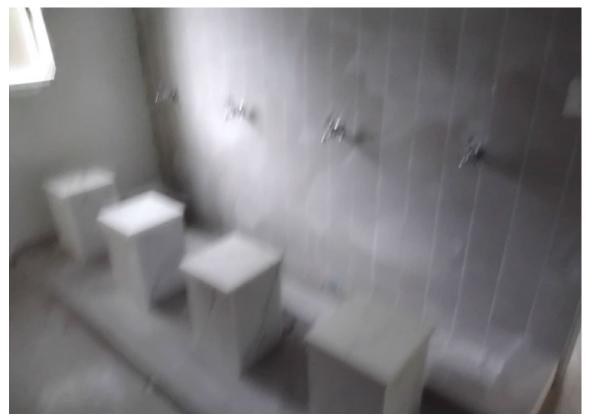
Washing (Wudu) area in the ground floor bathroom already installed.
